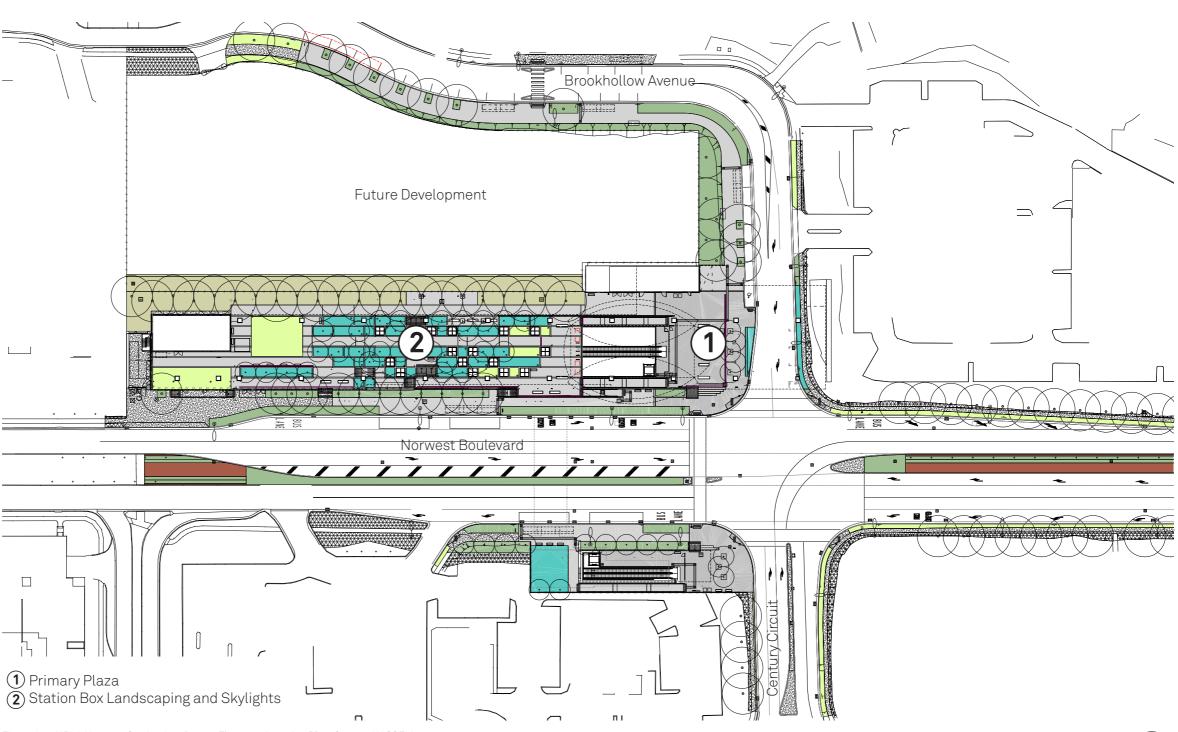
NRW_Norwest Station Landscape Elements Location Plan. Source: HASSELL.
